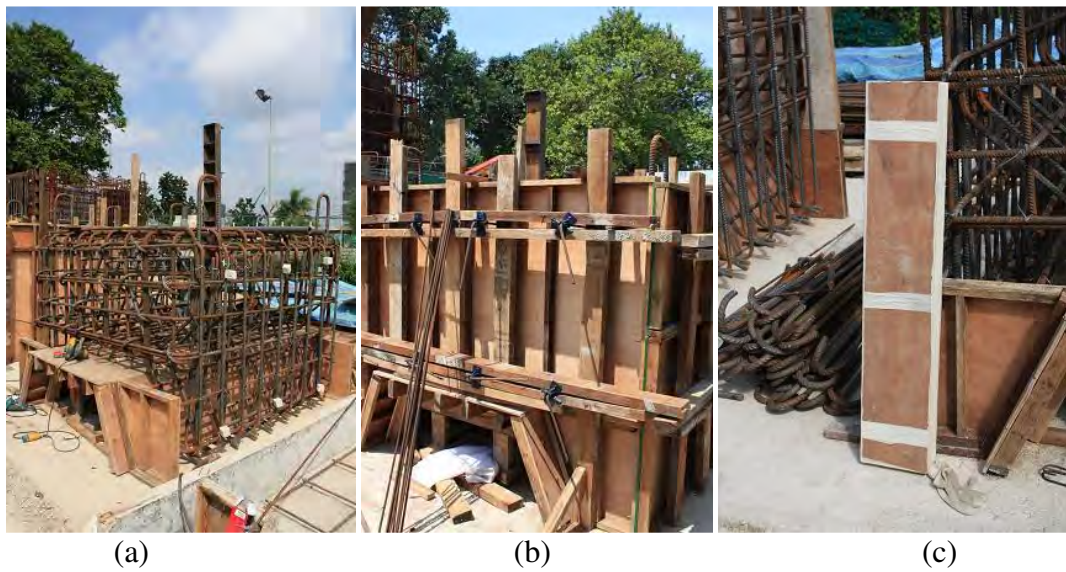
Construction of foundation (a) Foundation reinforcement (b) Formwork (c) Column stopper
